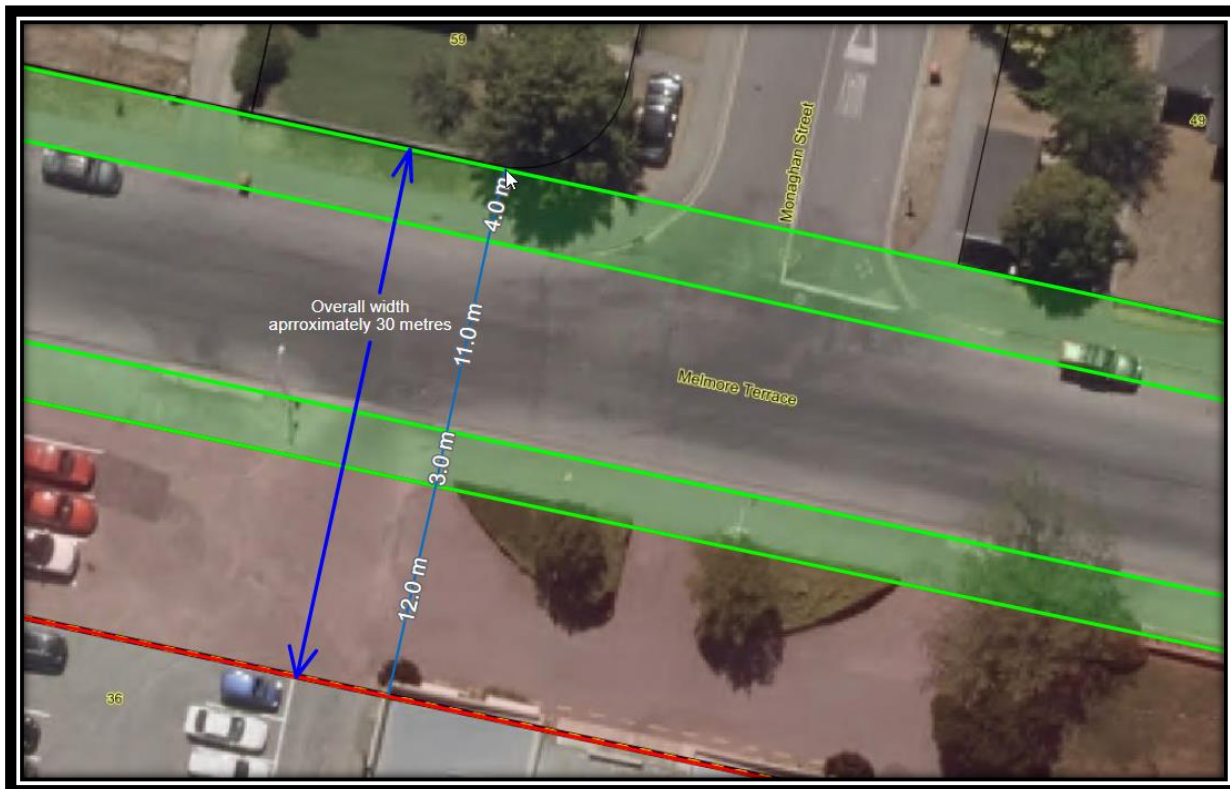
Overview of the Legal Road Width in Front of the Hall
